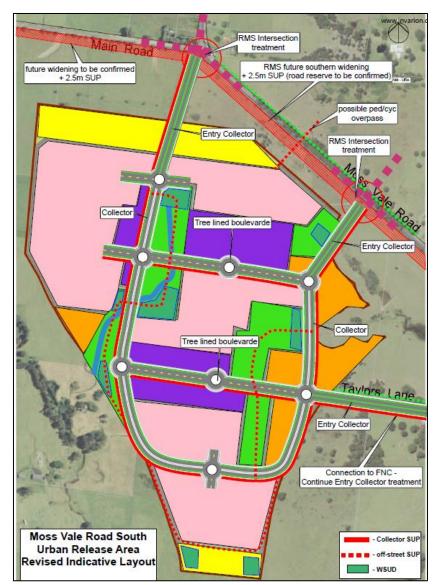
Assets & Works Group Suggested Revised Indicative Layout Plan
